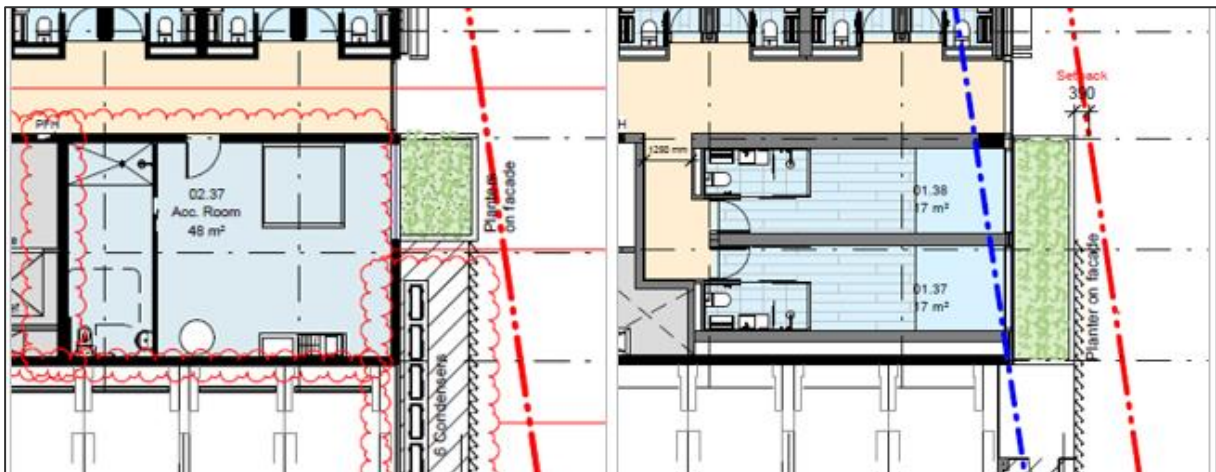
| Level 1-4 floor plan approved (left) and proposed (right) (Source: Applicant's Application)
